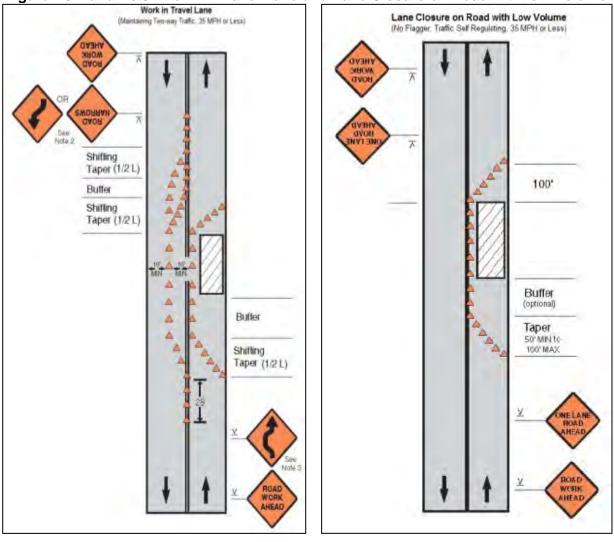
and A6.5: Work in Travel Lane and Lane Closure on Road with low Volume
